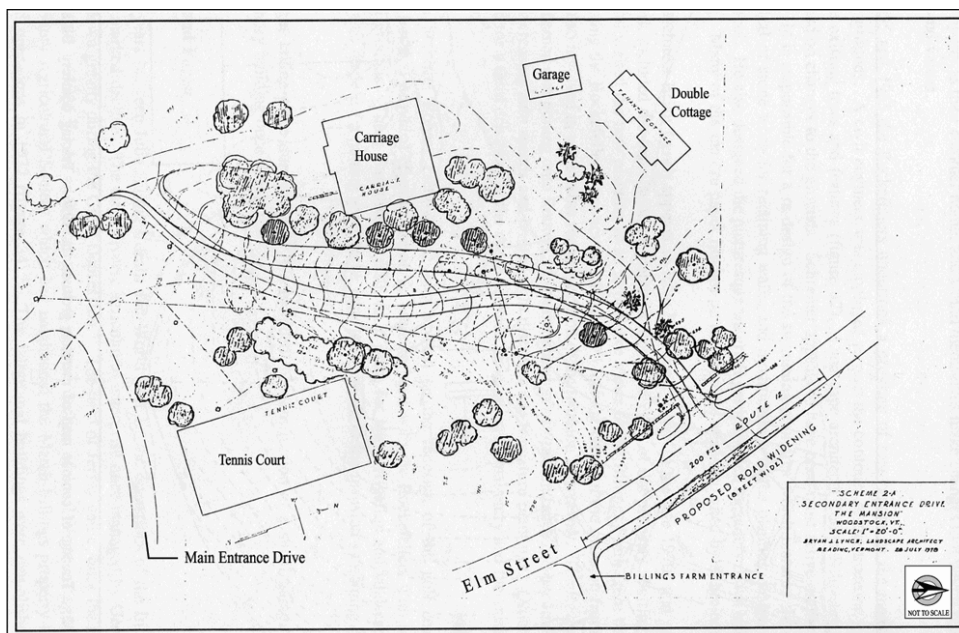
Plan by Bryan J. Lynch of the Secondary Entrance Drive, built in 1978.
